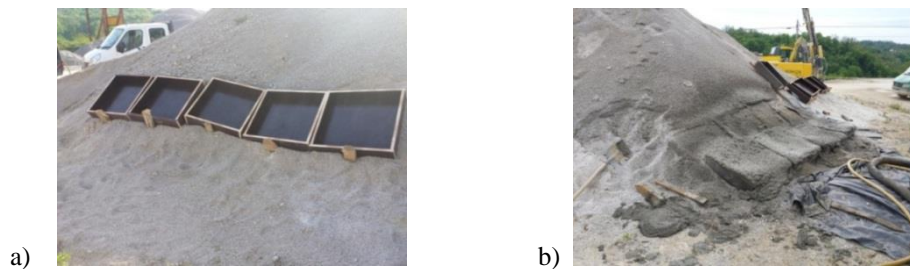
Preparation of in-situ specimens: a) modulus, b) specimens after spraying
